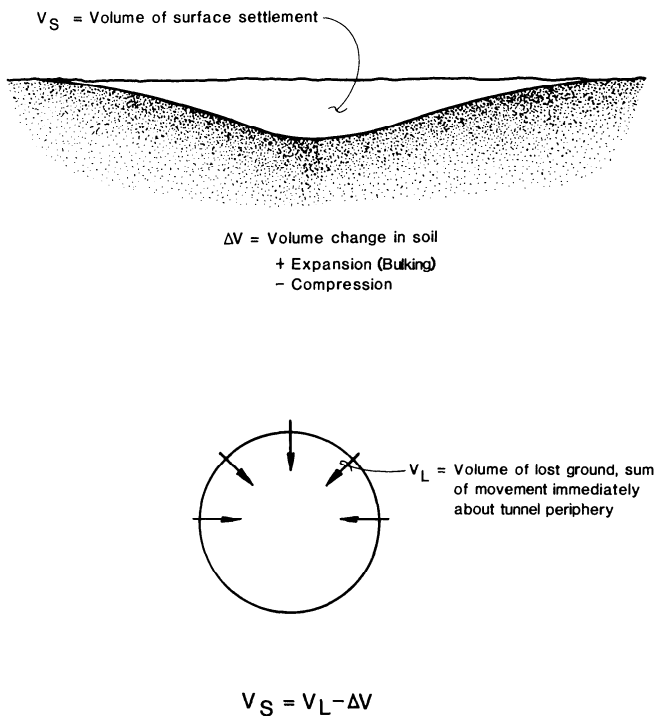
Terminology for tunneling settlement and lost ground.
